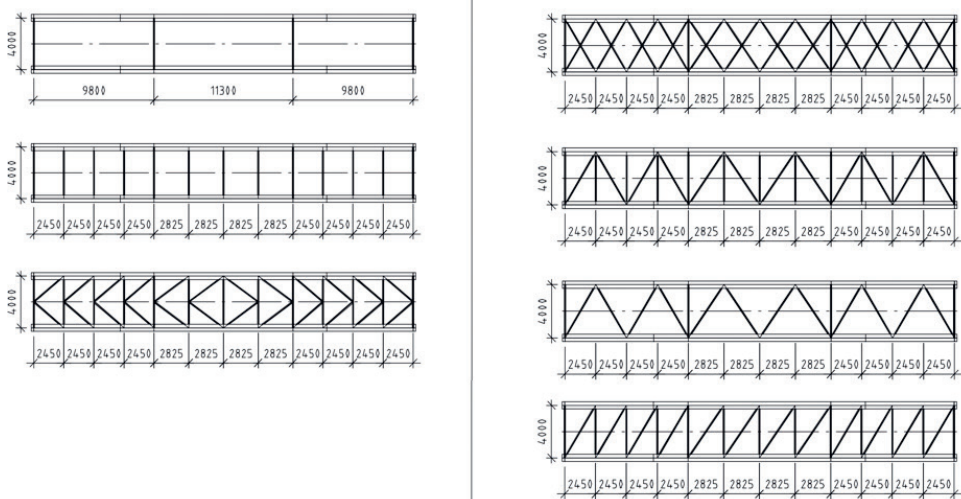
Layout and shapes of the original design and the six different bracing systems
